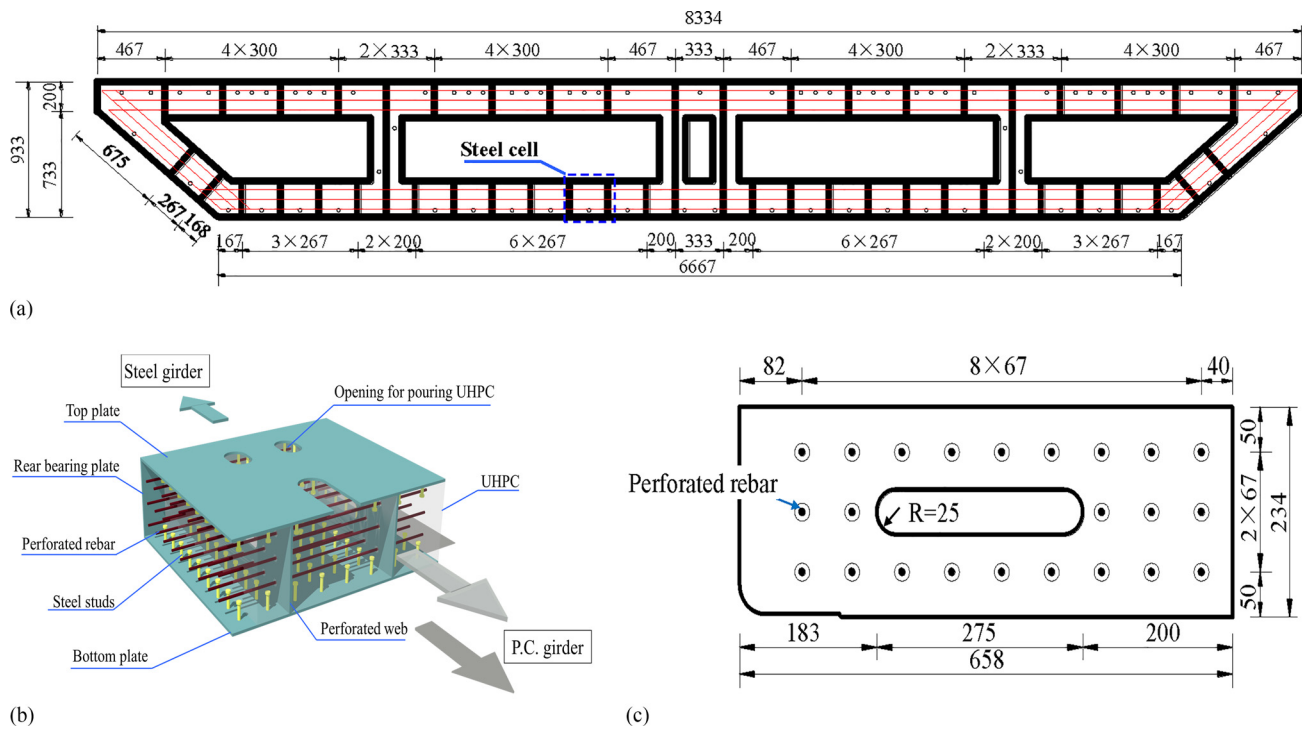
Steel–concrete joint: (a) joint cross section (J-J); (b) arrangements of a typical steel cell; and (c) detailed dimensions for a perforated web. (unit: mm).
